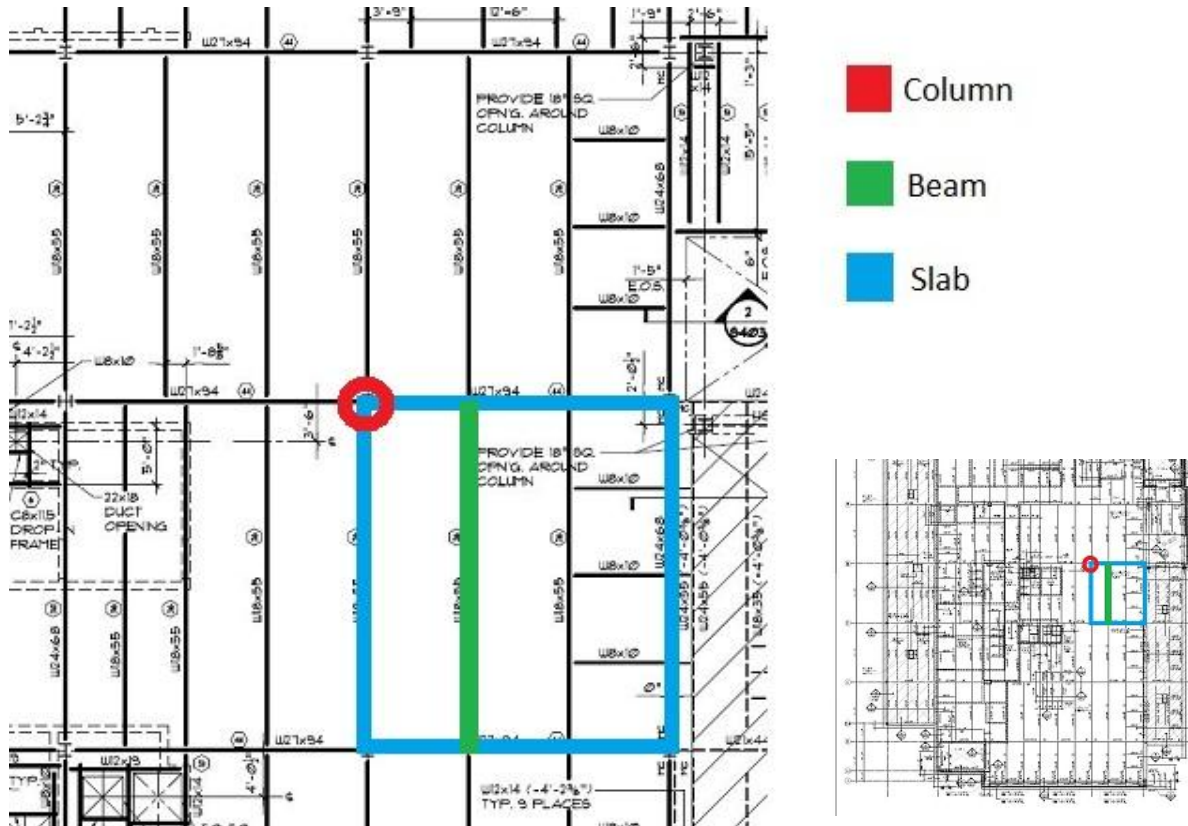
Images showing the column, beam and slab being considered for calculation. It is located on the second floor, in the middle of west wing.
